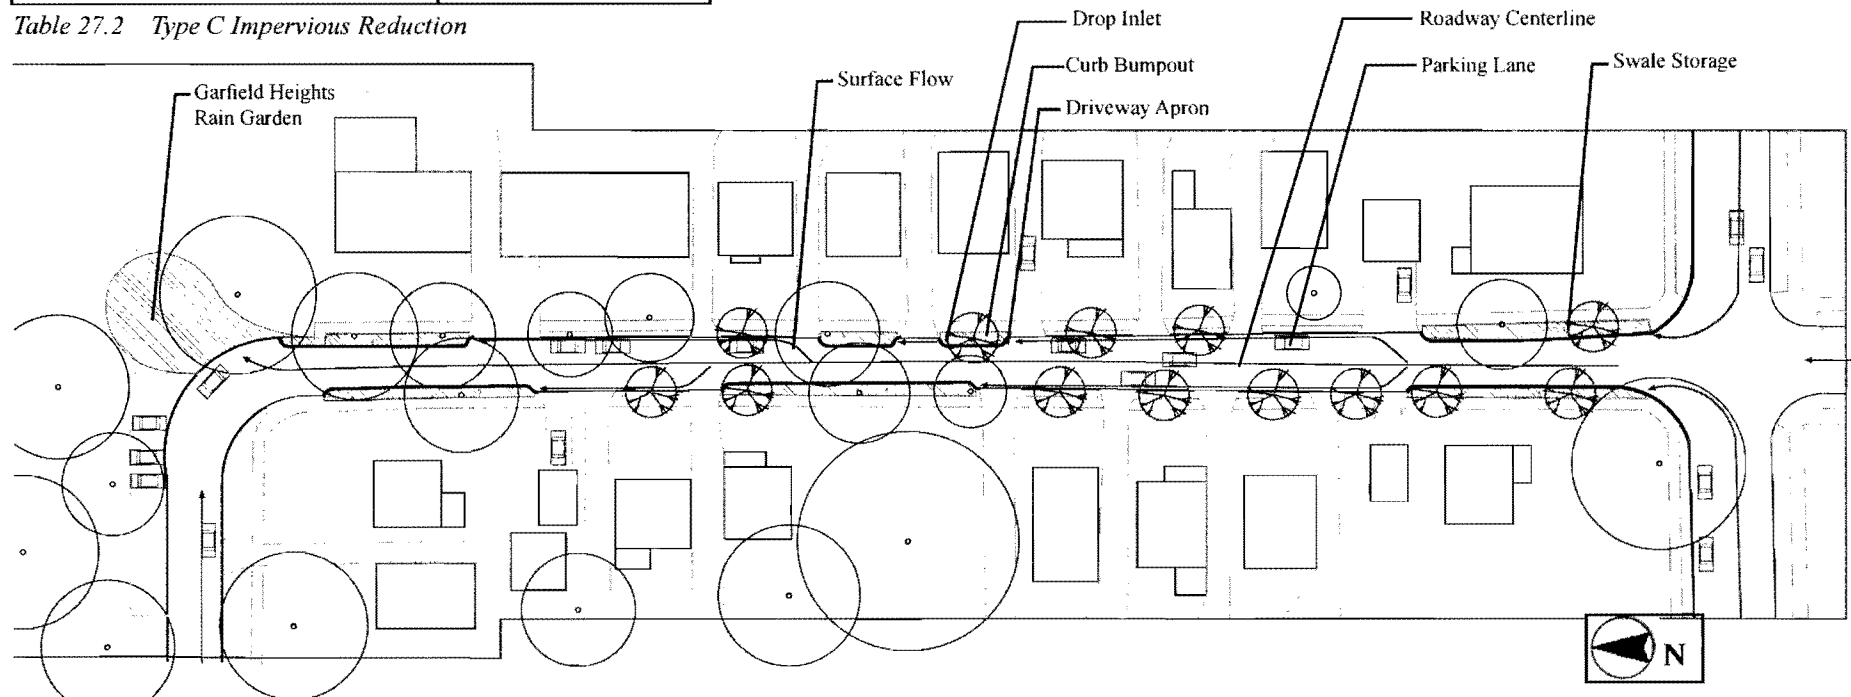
117th Street ROW Proposed Design up to McCracken Avenue
